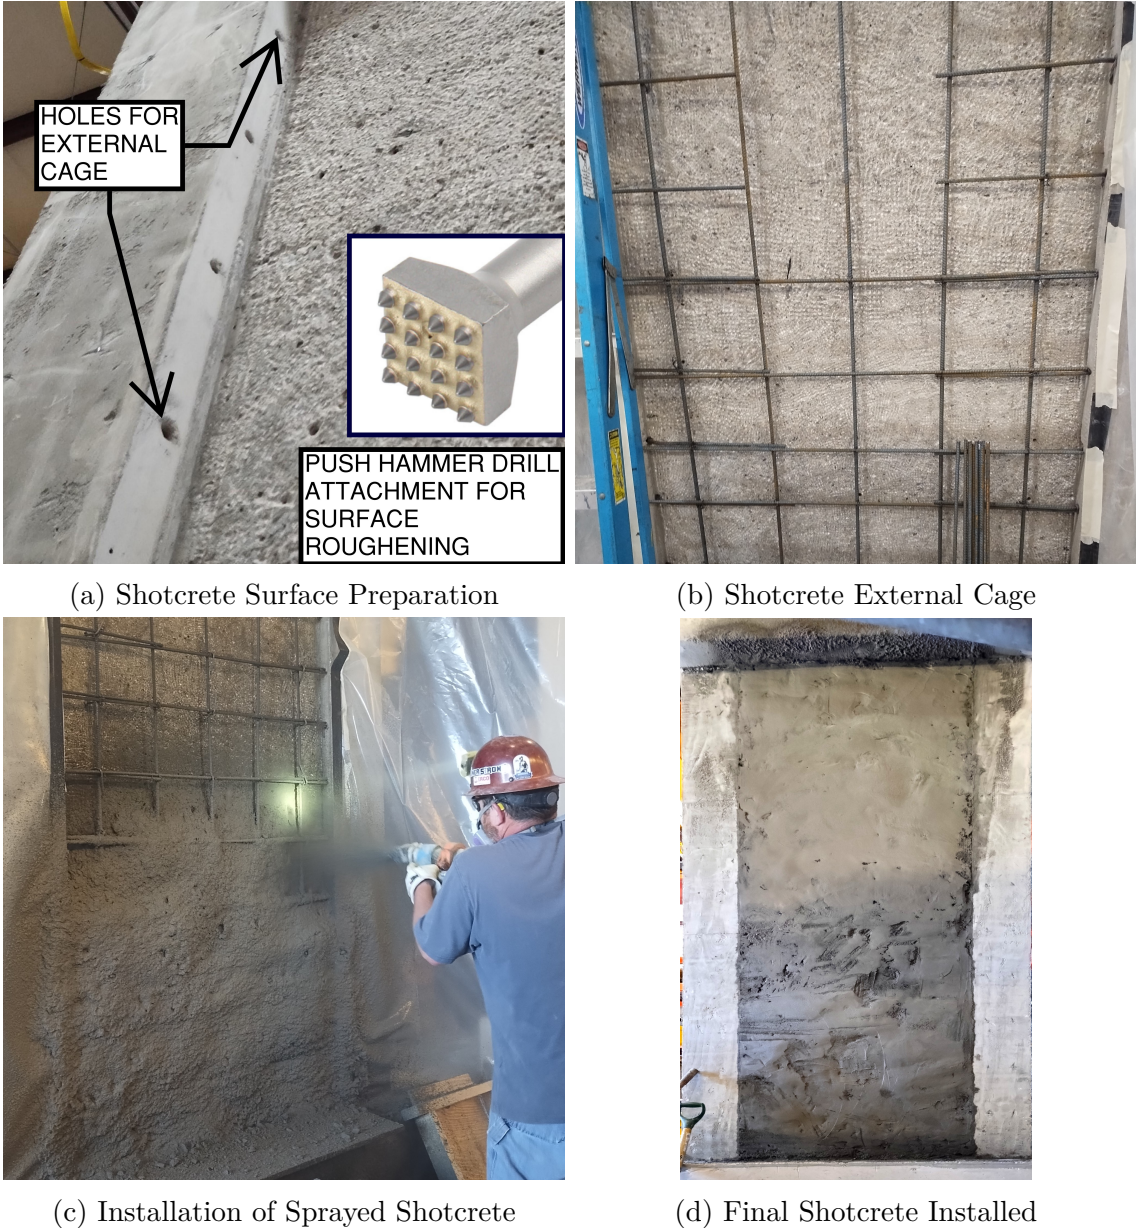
Shotcrete Installation Process, Specimen S1CW
